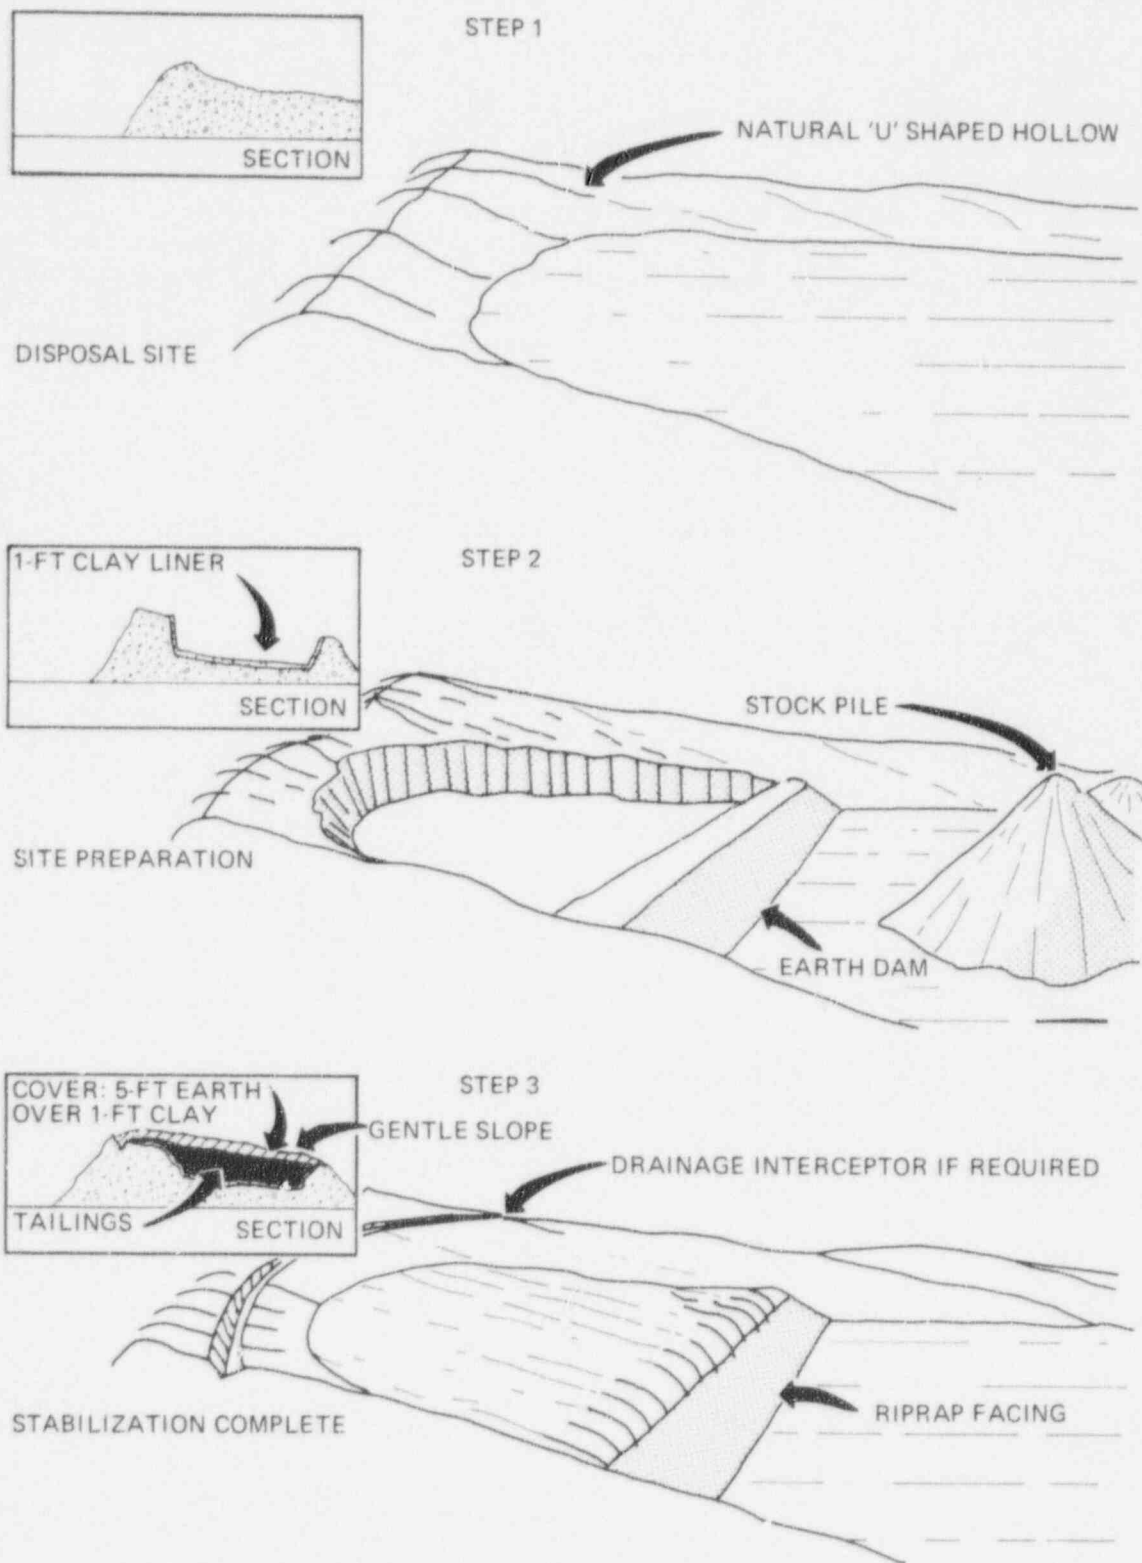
SCHEMATIC OF TYPICAL TAILINGS DISPOSAL SITE
